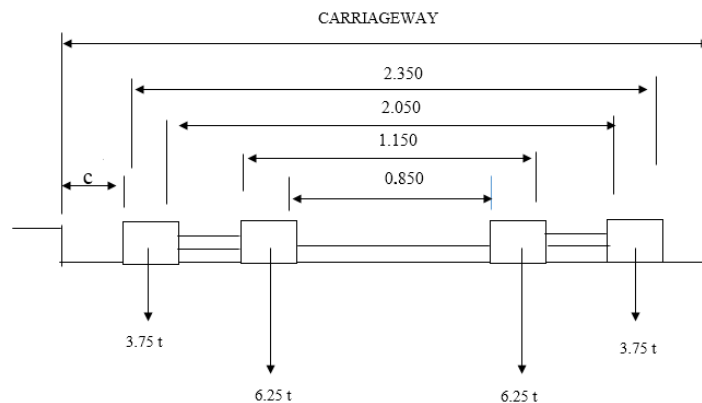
Elevation view of IRC Class AA Loading (all dimensions are in m).
